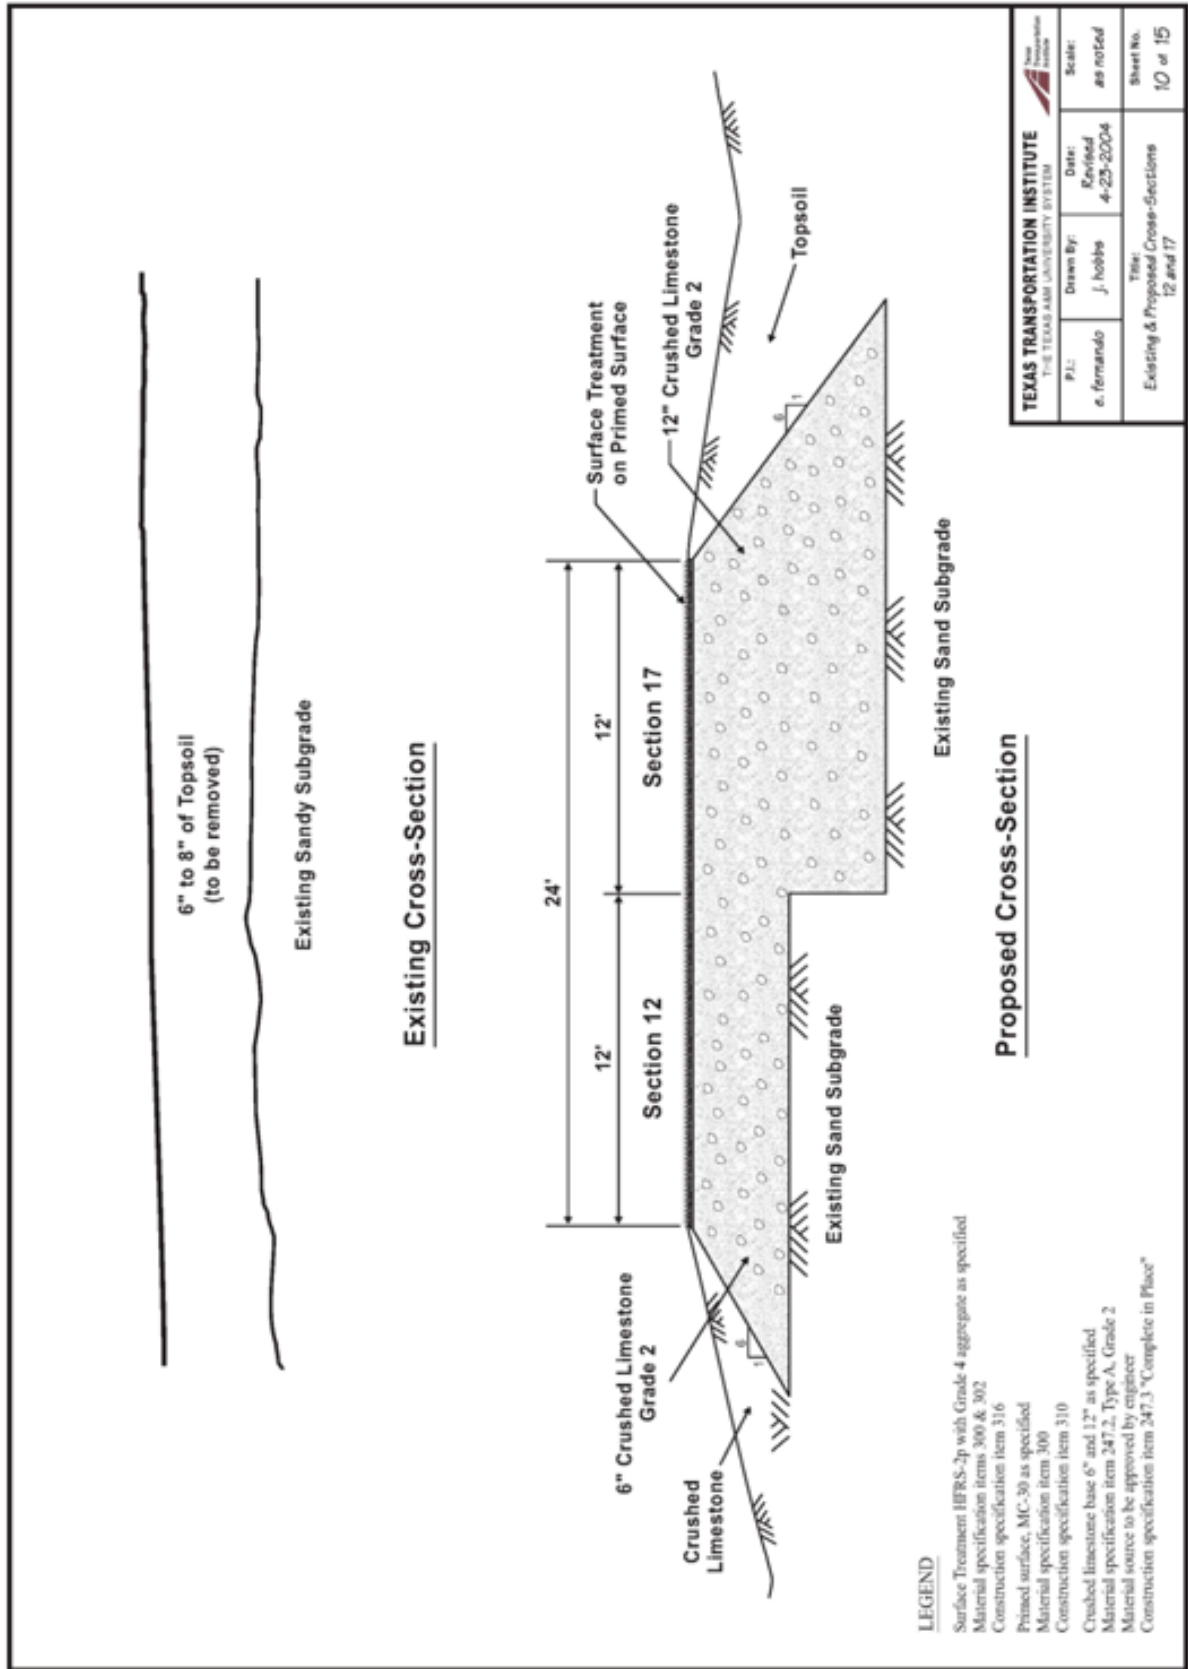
Existing and Proposed Cross-Sections for Sections 12 and 17.
